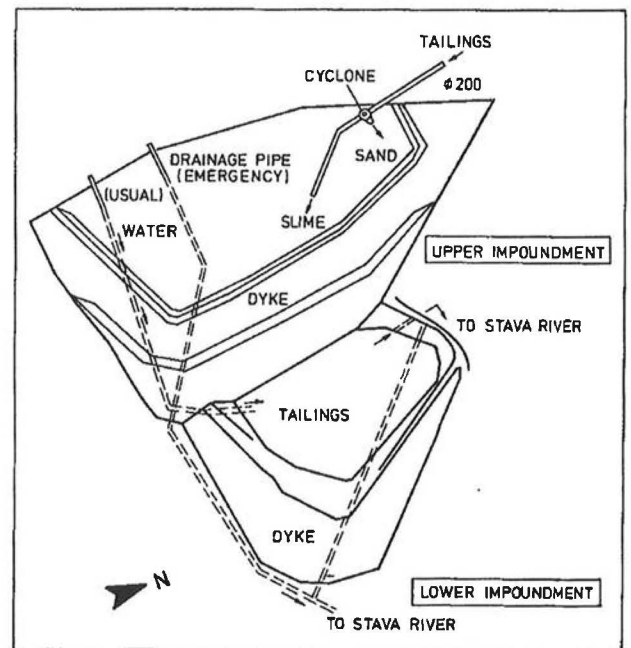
Schematic layout of Prestavel tailings dams (Berti et al., 1988).
